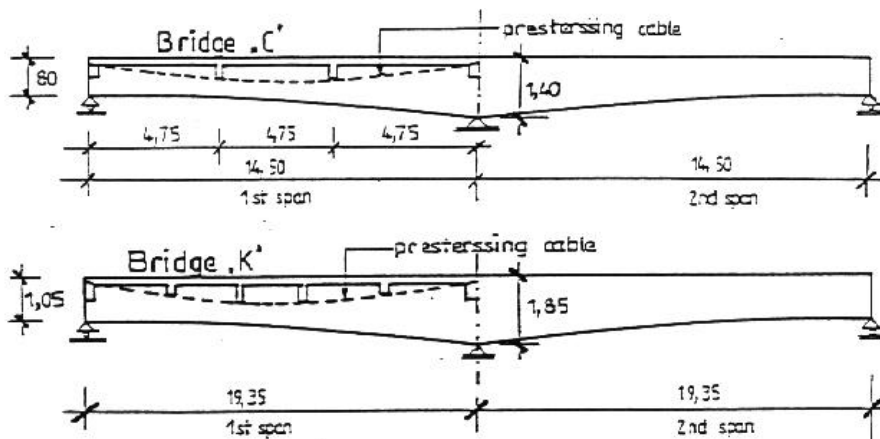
Longitudinal section of the examined bridges with beam-slab superstructures
